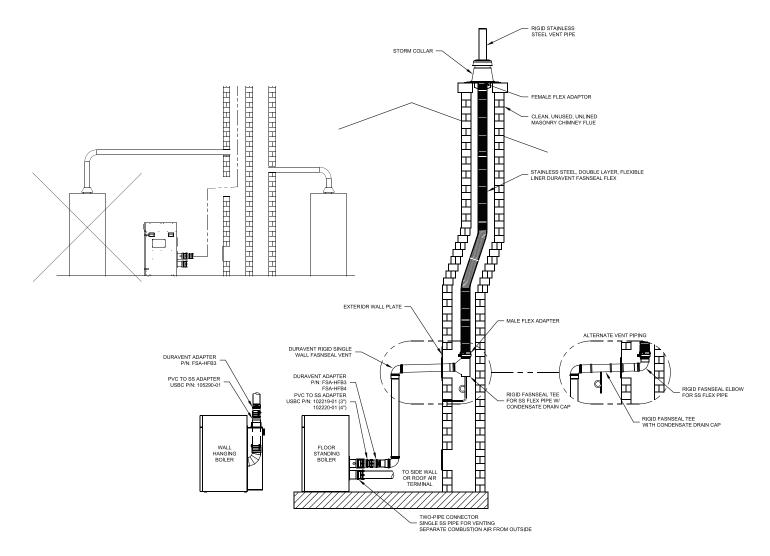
Flexible Stainless Steel Vent in Masonry Chimney with Separate Combustion Air Intake
